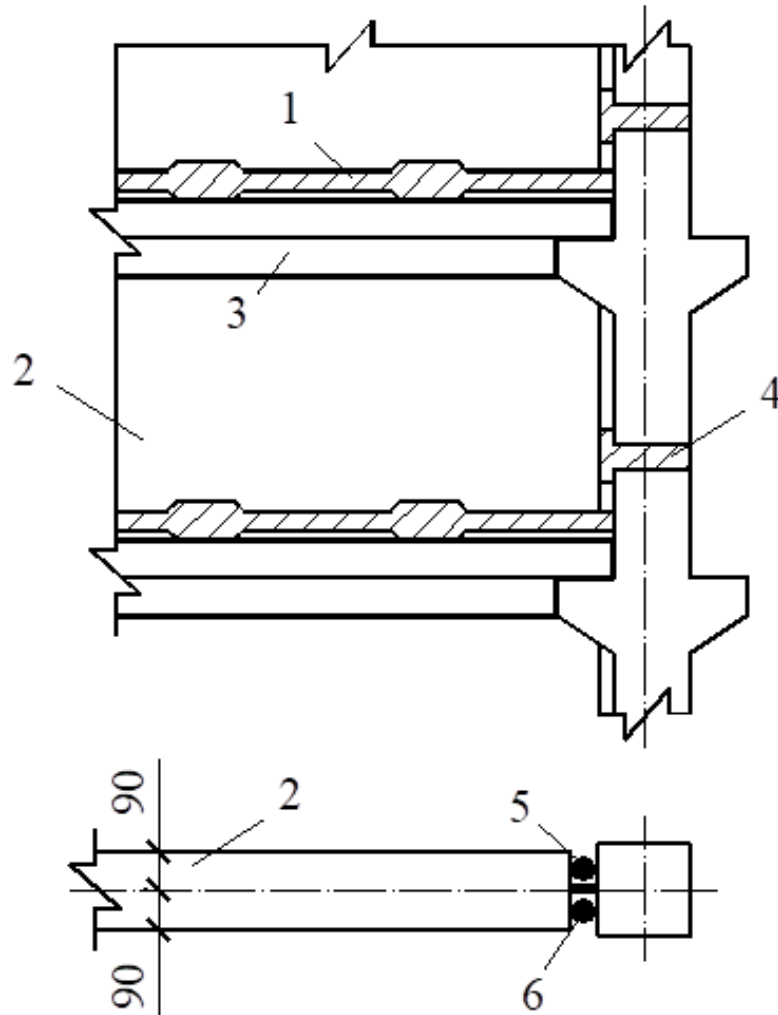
Connection of connecting (bracing/shear) walls to columns:
